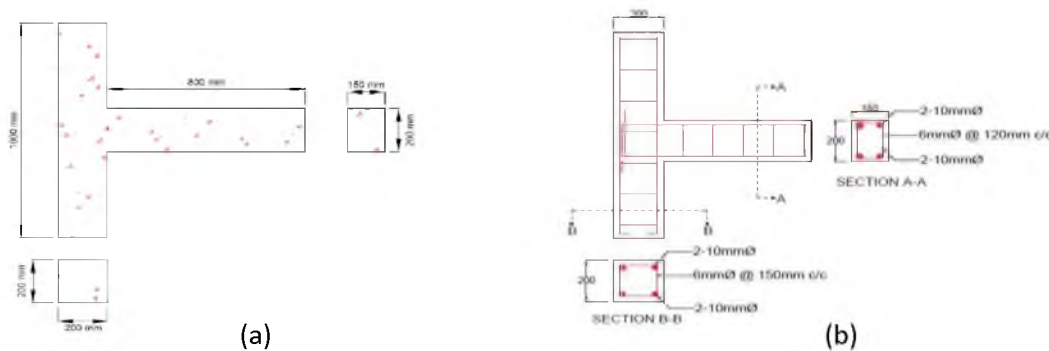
(a) Dimensions of the beam-column joint specimen, (b) Reinforcement detailing of beam-column joint [6]
